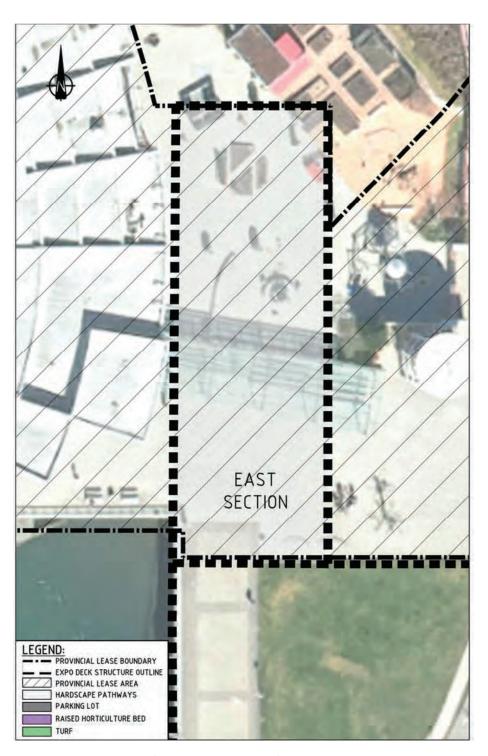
Plan View of Topside Landscape Surfacing, East Section
